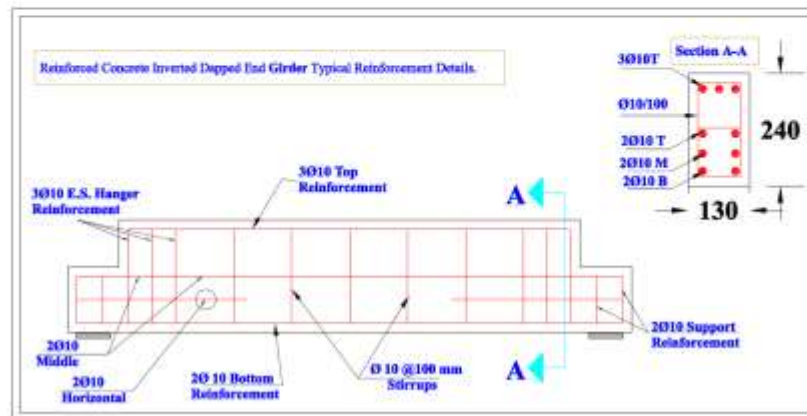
Reinforcement details of R.C. inverted dapped-end girders layout.
